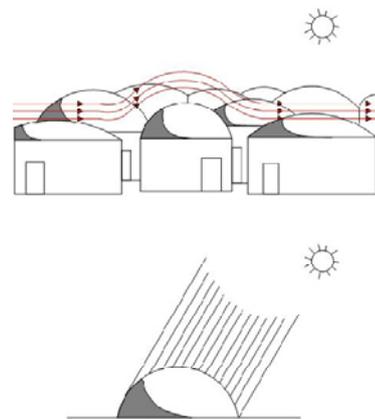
Openings on the dome shaped roofs are ventilation and daylighting elements
